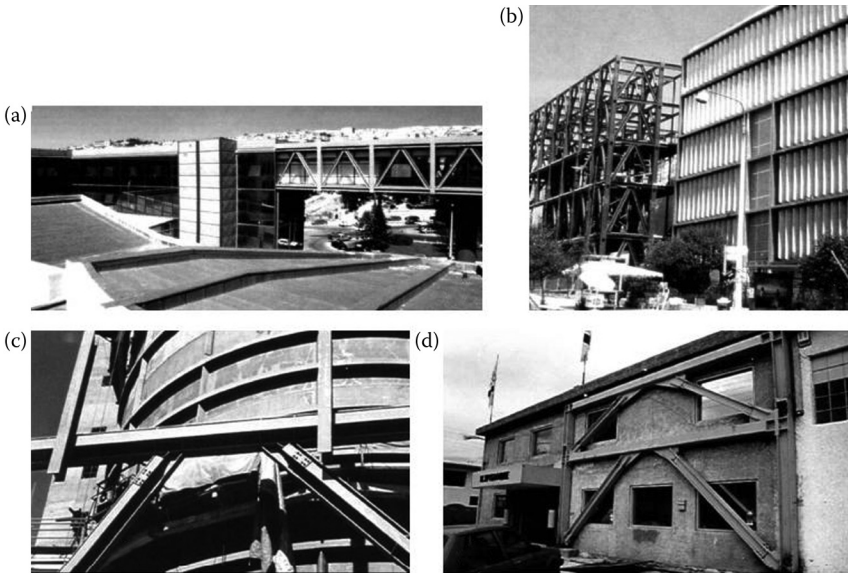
Steel structures in Greece: (a and b) Tessaloniki University; (c) EBF for power plant; (d) EBF for upgrading of damaged building.
